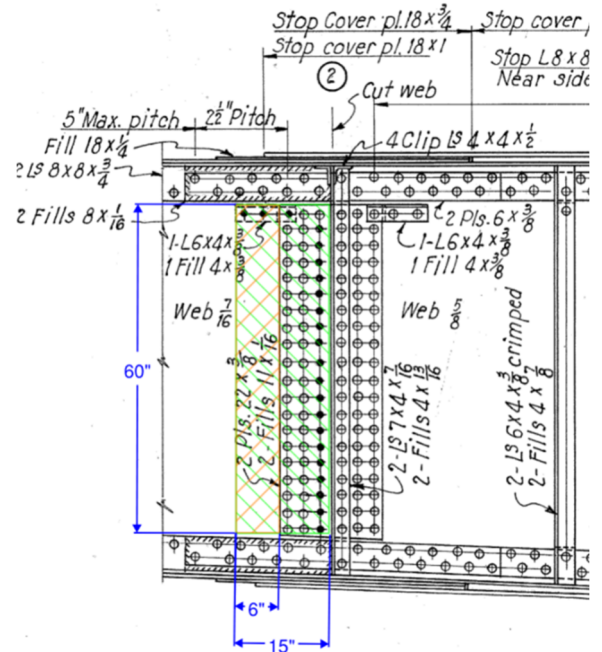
Bascule Girder elevation view highlighting controlling rating location
